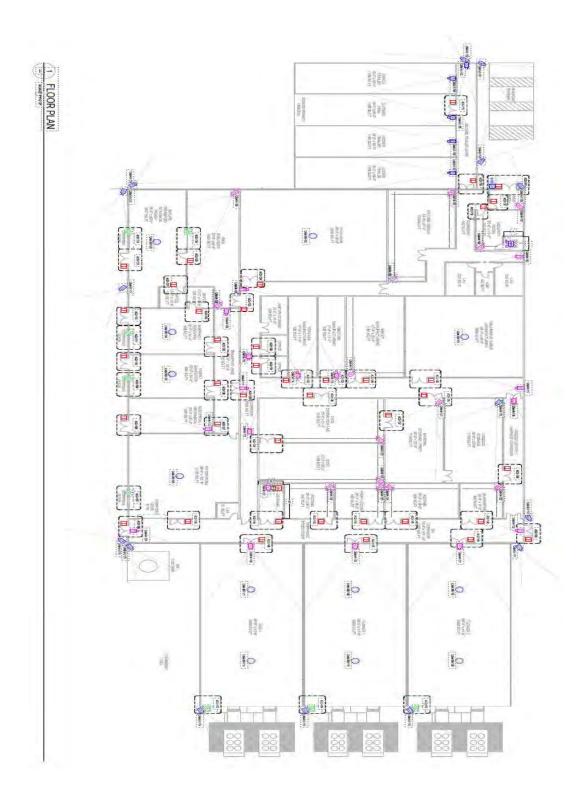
Engineering Plans and Specifications (Cultivation Facilities)
